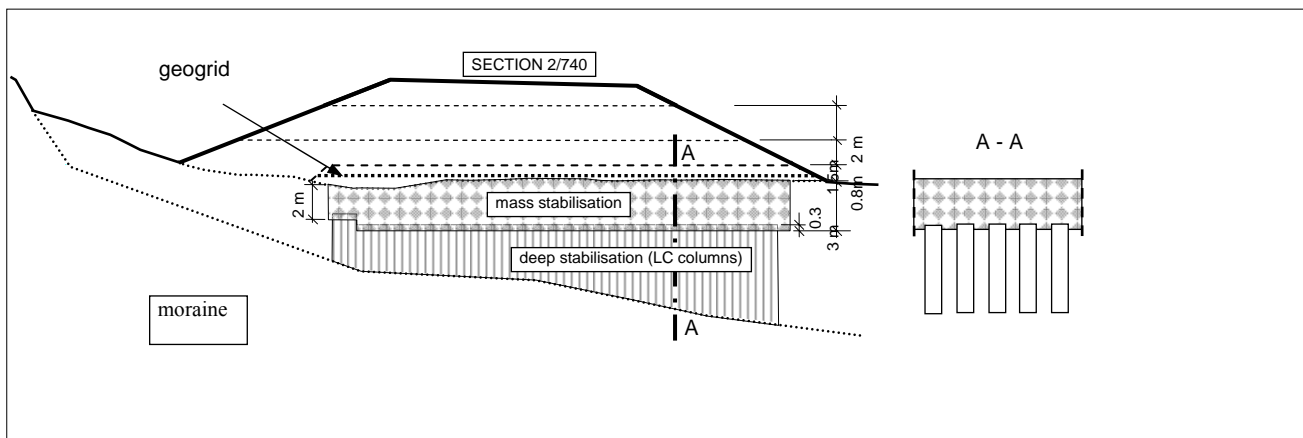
Cross section of a road embankment stabilised with DDM and mass mixing (Moraberg, Sweden, 2004).
